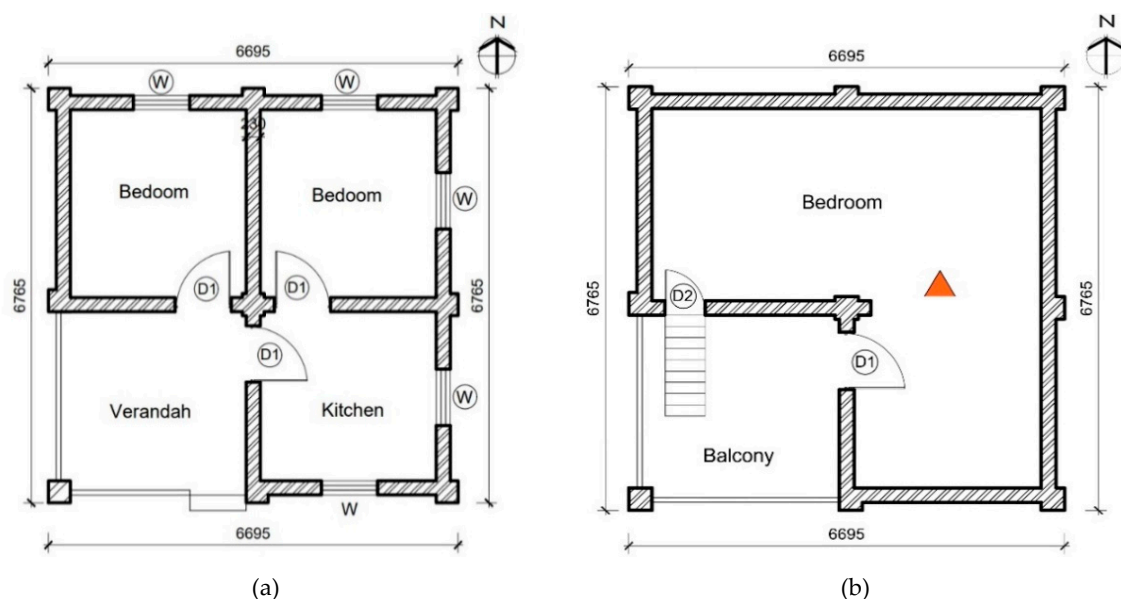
Floor plans of a post-disaster permanent house: (a) Ground floor plan; (b) First-floor plan.
